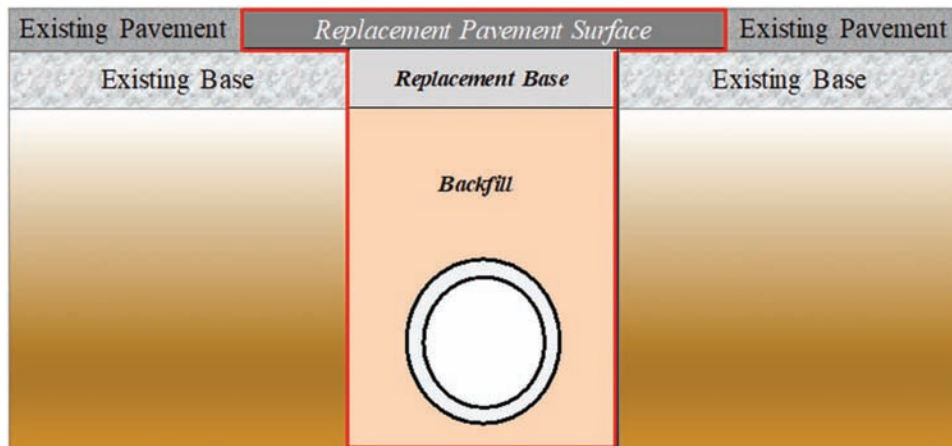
Typical T-section patch with additional section of pavement cut on either side of the trench.
